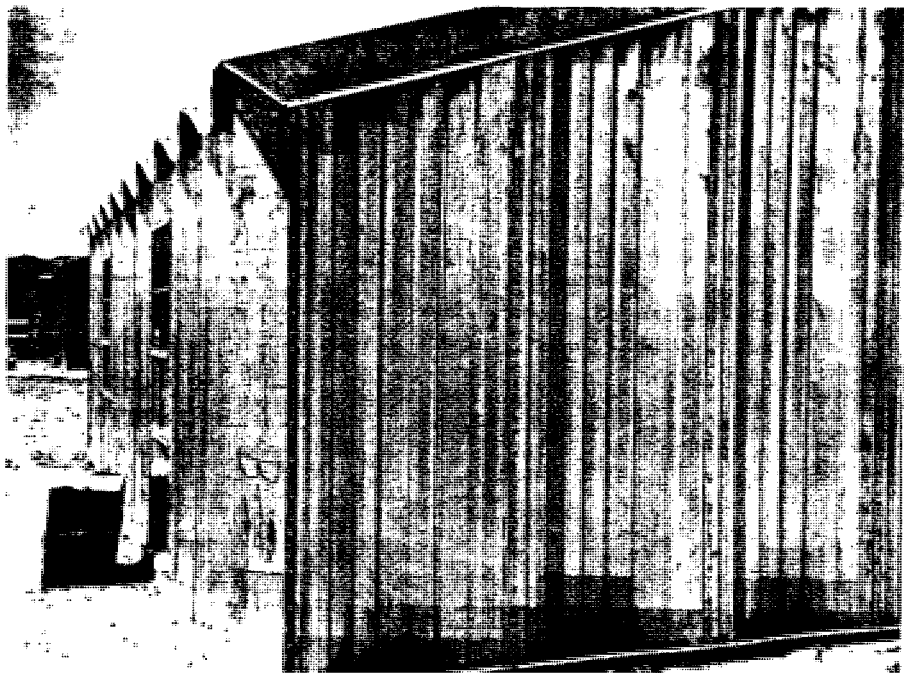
Self-framing corrugated steel panel building before a nuclear explosion, Nevada Test Site.
